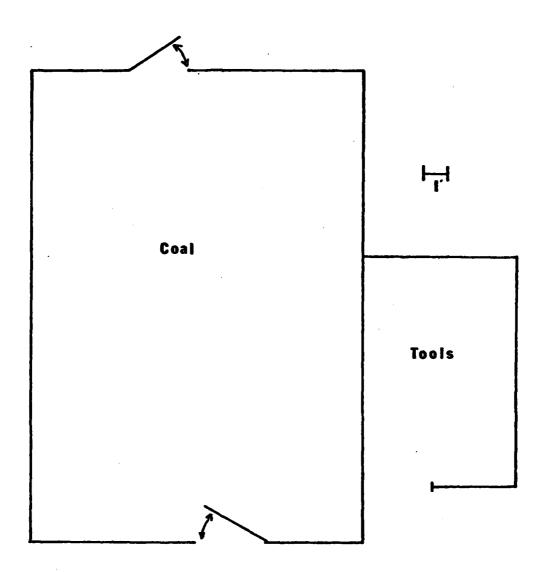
Cunningham outbuilding. Plan of Wood and Coal House.
